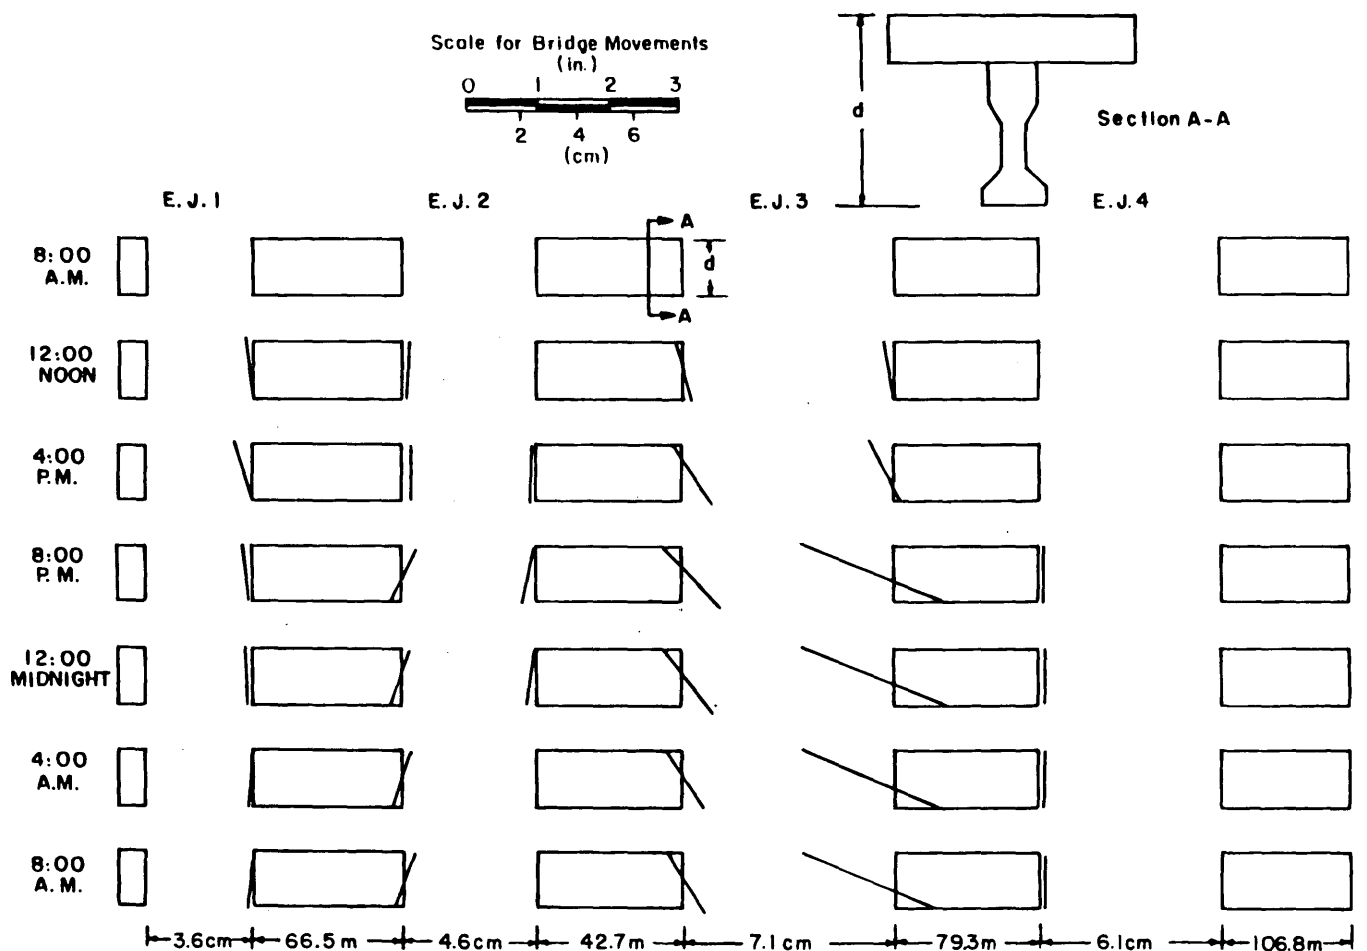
Elevation of north side girders showing 24-hr movements with respect to cap for October 22, 1987. (Note: Longitudinal dimensions of girders and joint spacings are not to scale, but actual end movements are to the scale indicated.)
